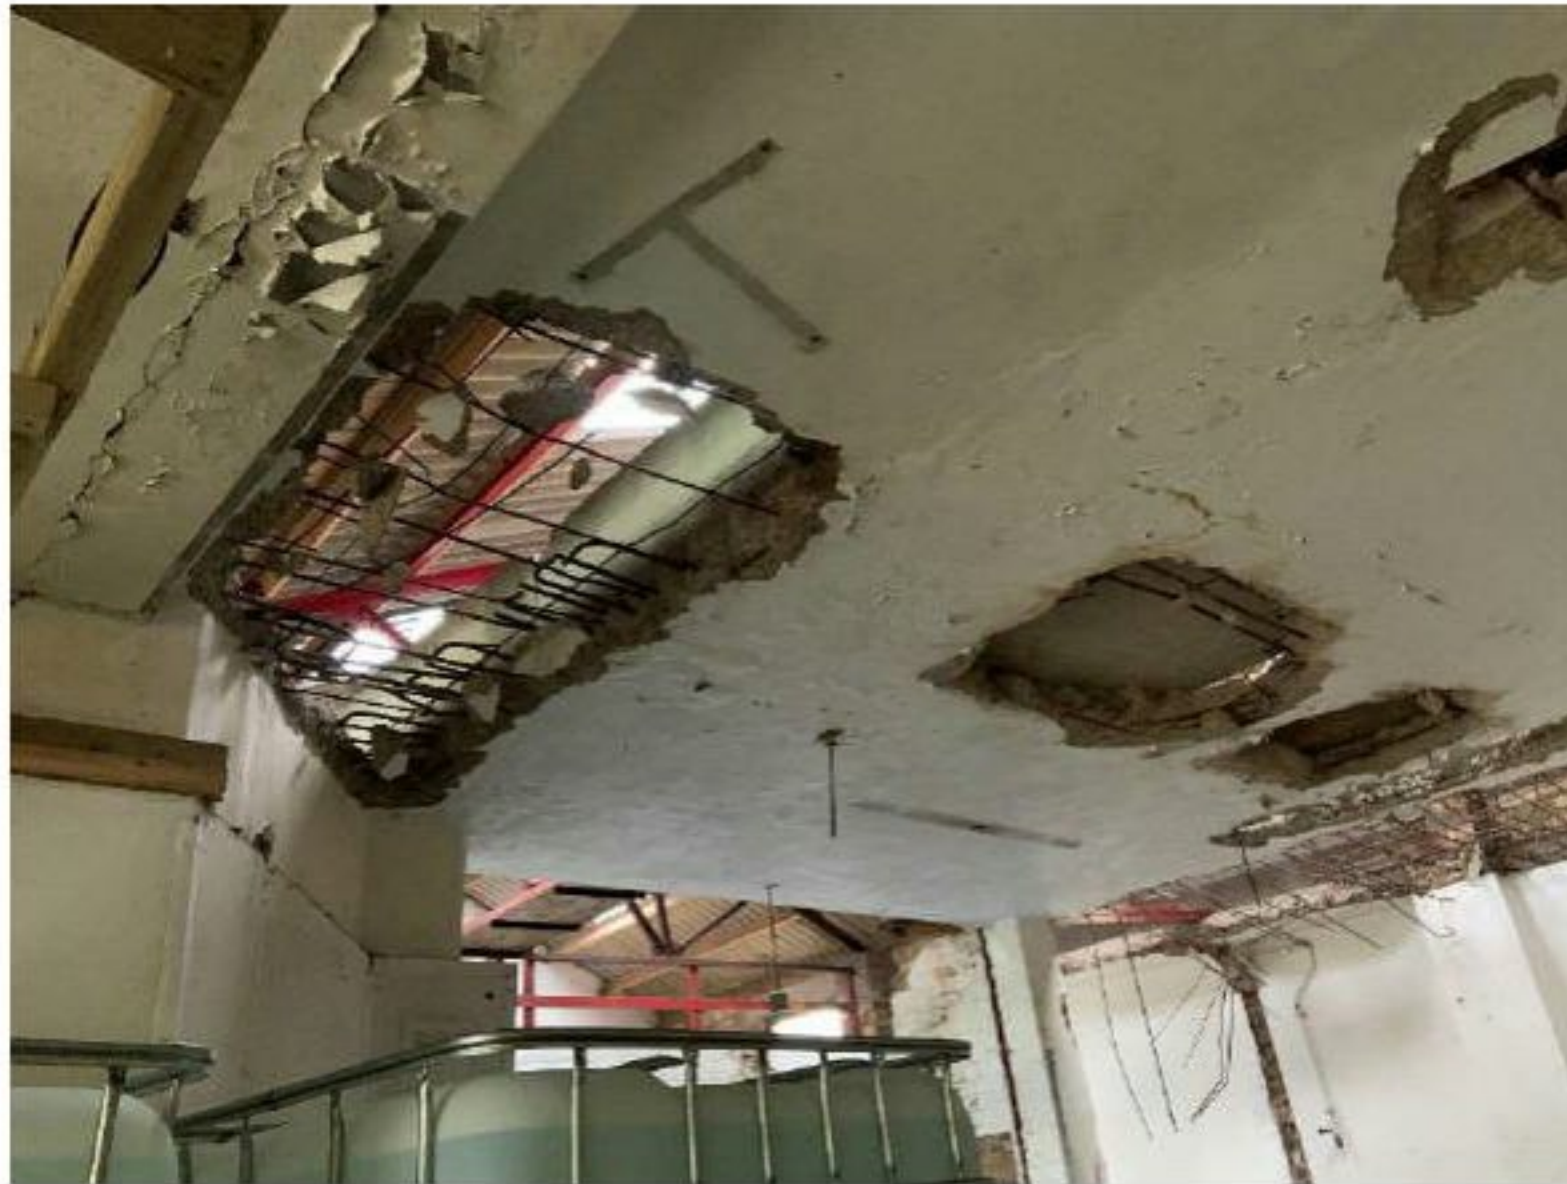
New Workshop/Store – Precast Ceiling/Floor
